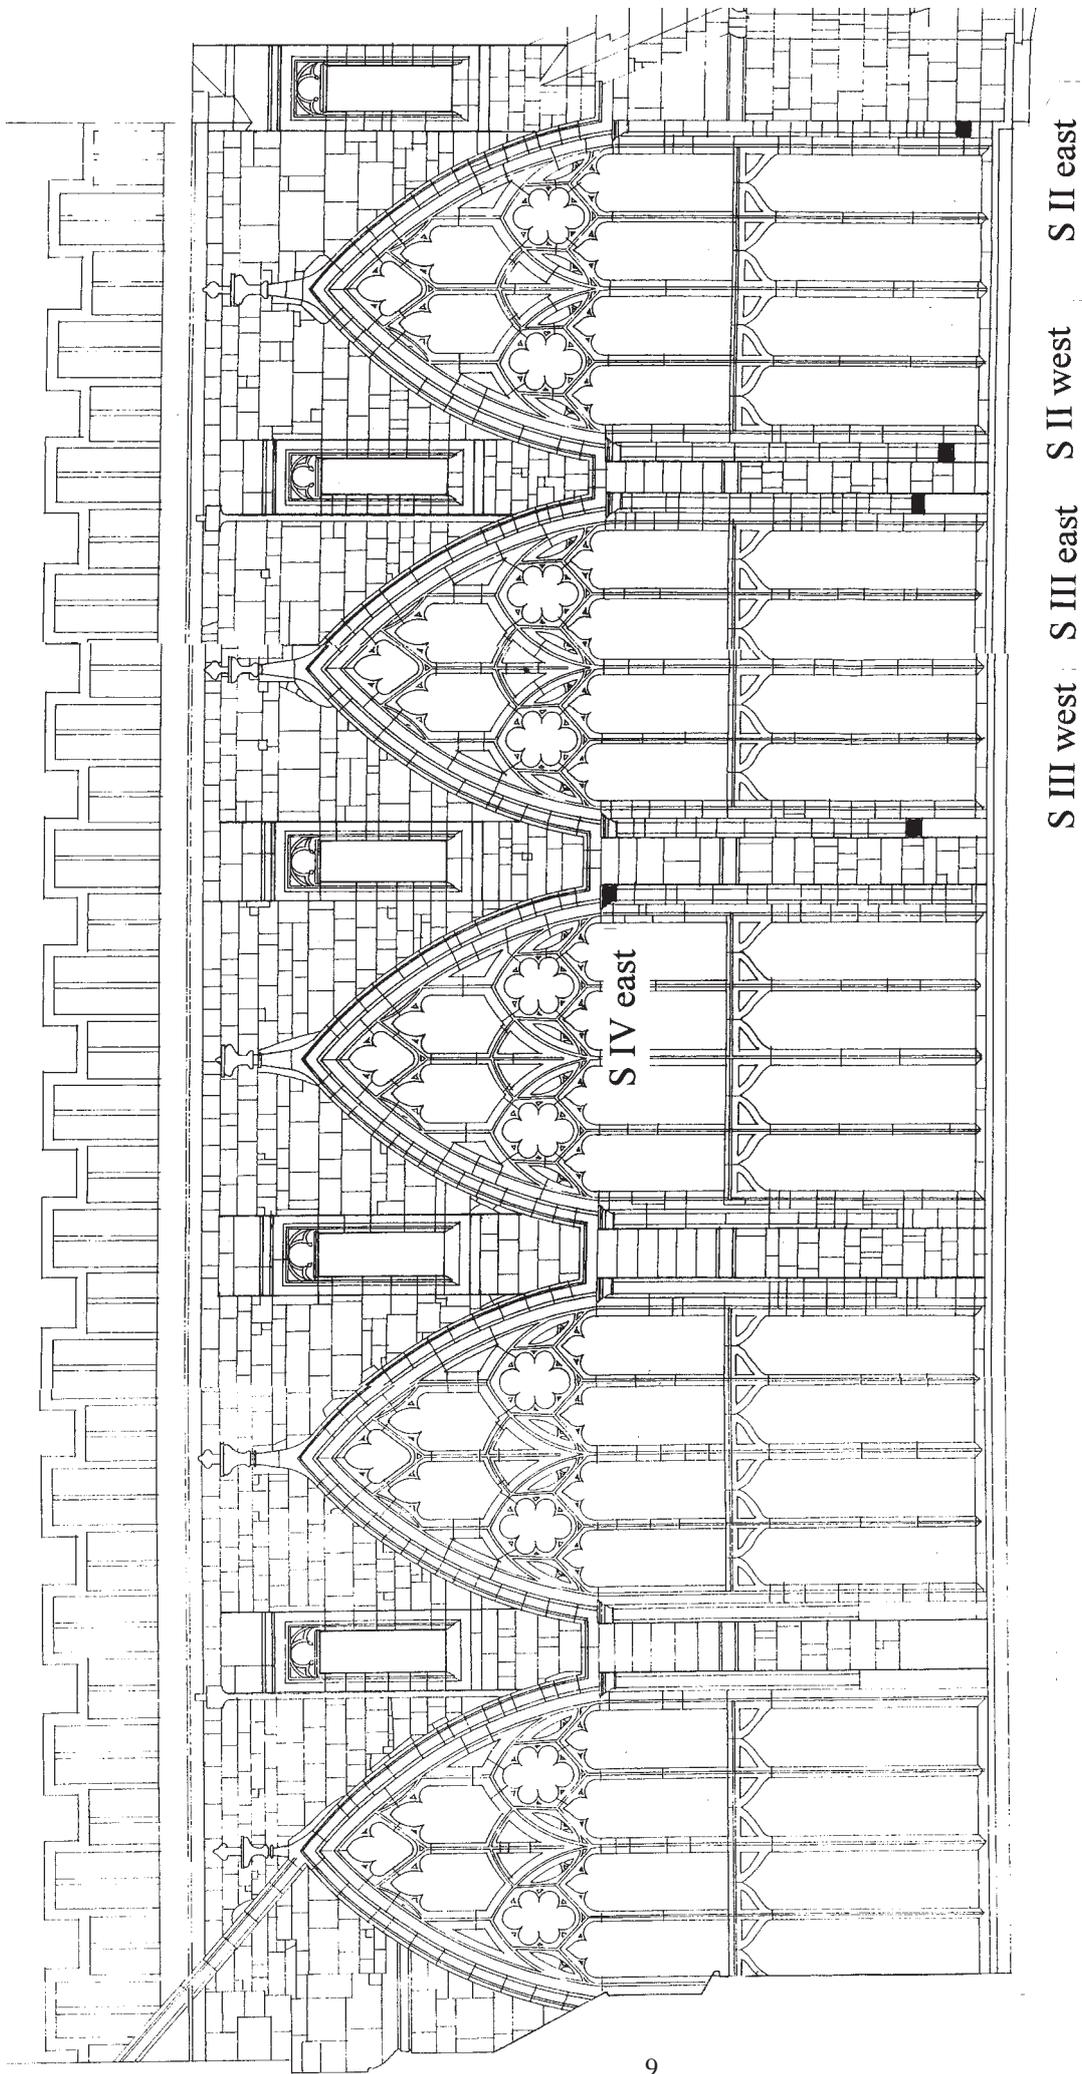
S elevation of choir clerestory after restoration in 1999. Photo: Alan Norton.
